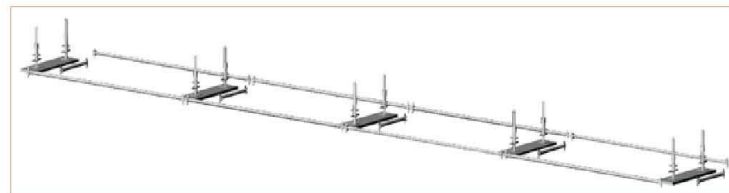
Stage 2 – Fitting of the primary elements
